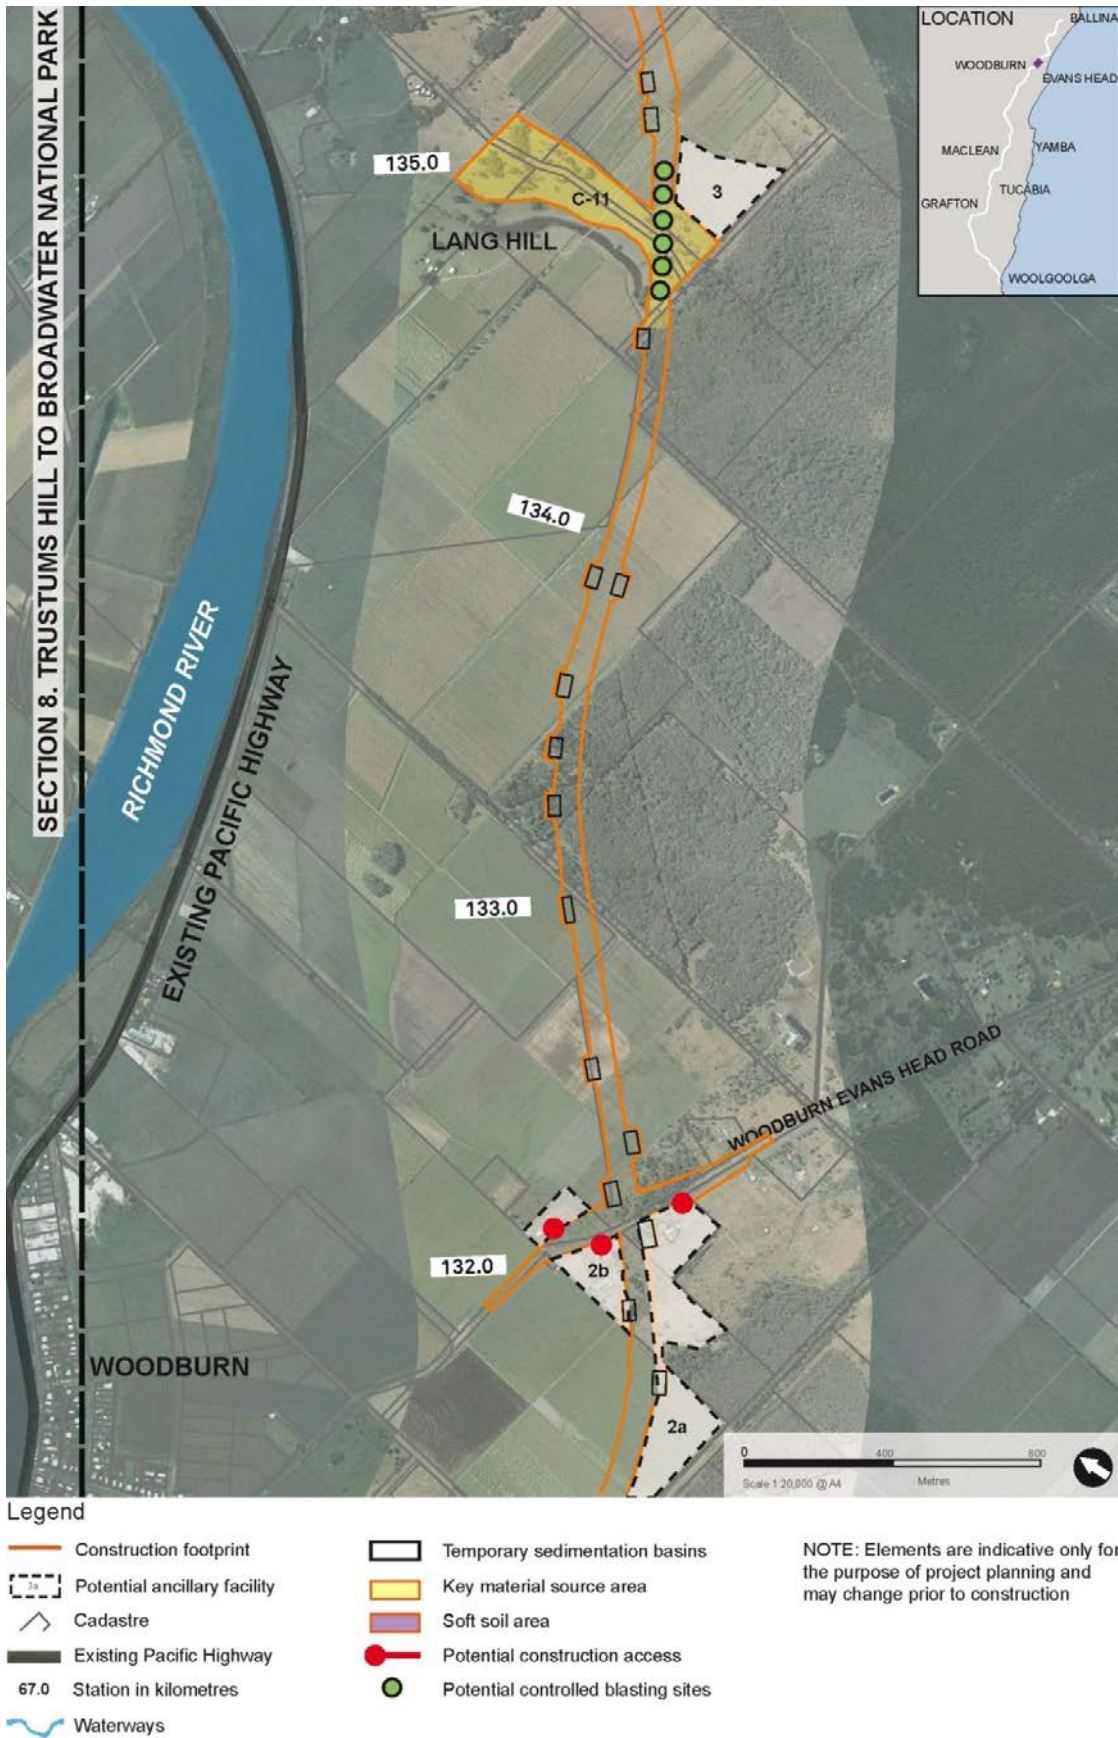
Extent of construction and construction features Section 8 (Station 131.5 to 135.4)
